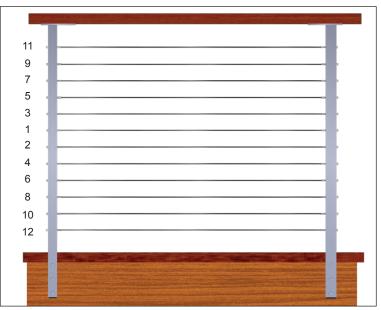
Figure AI. Tensioning Diagram - Begin with the center run of cable and alternate working above and below until cables are tight.
